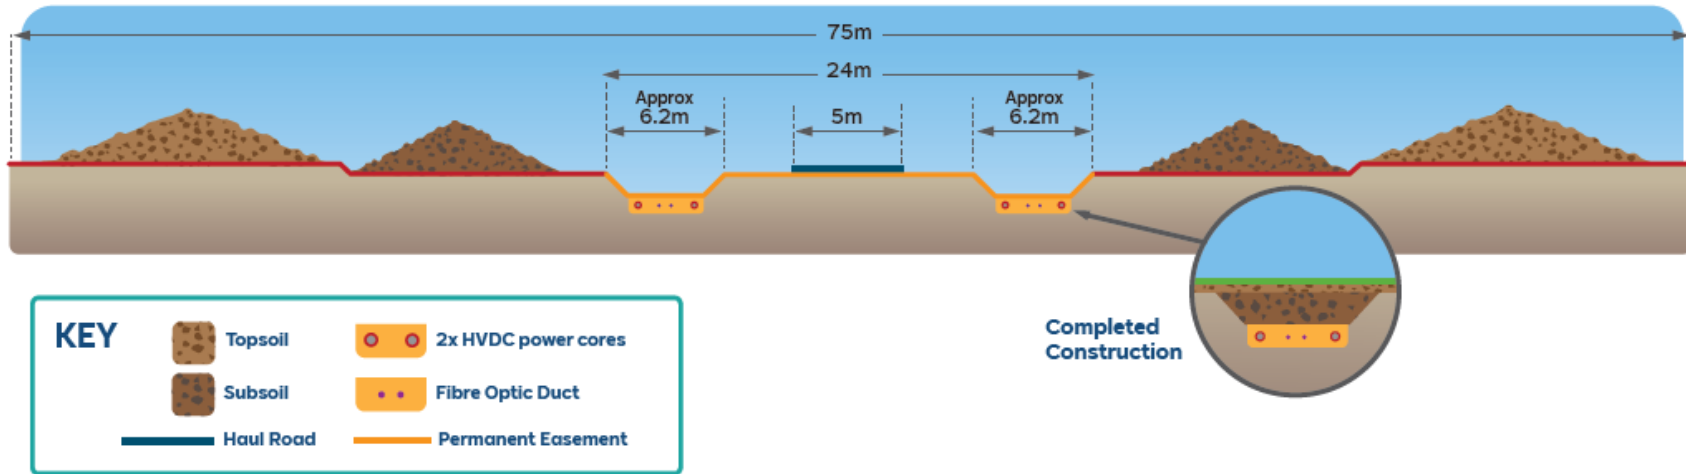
illustrative Section of Onshore Export Cable Corridor to the Onshore Converter Stations, Including Power Cores and Ducts, Construction Haul Road and Proposed Topsoil Laydown Areas Either Side
